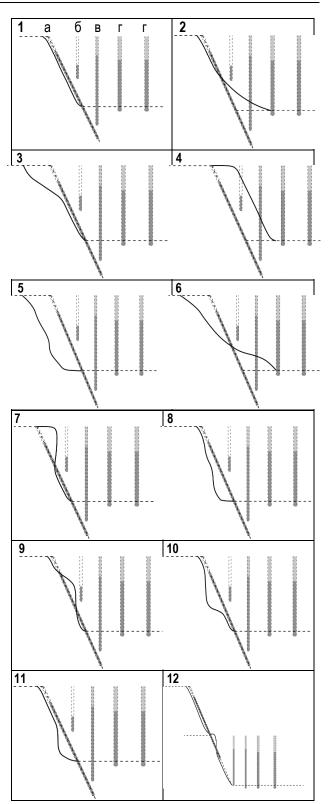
Grafical representation of the 12 examples for the achieved pit wall compared to designed (Cebrian, 2017 c with cnanges) Legend: designed wall geometry of the bench; ______ achieved wall geometry after excavation; a – pre-split hole; δ – stab hole; B – buffer hole; r – production holes. Dark grey color shows the explosive material, light grey – stemming.
